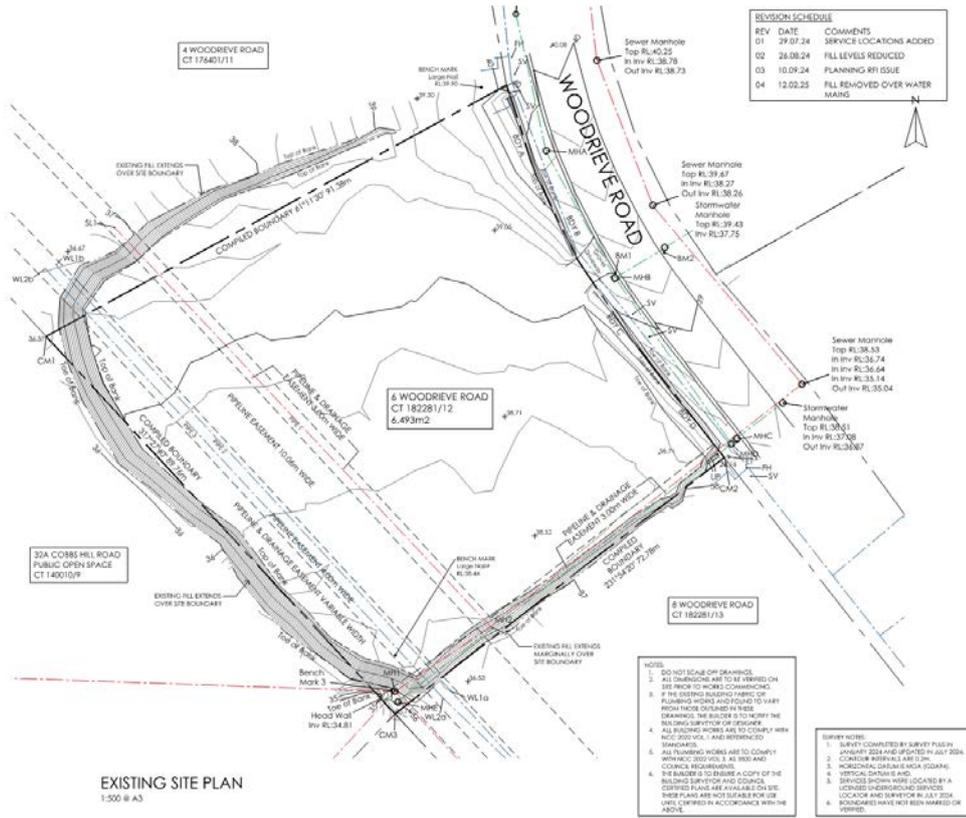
Existing site plan (with unapproved land fill) (source: the application)
